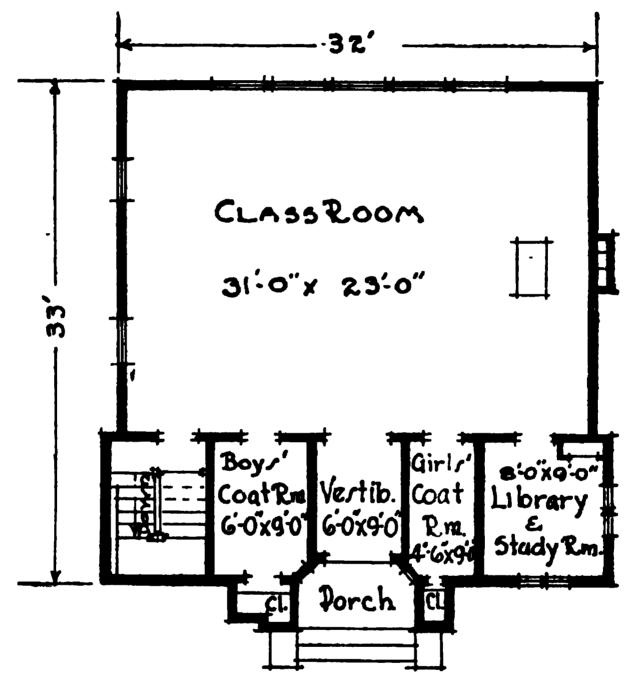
Floor plan, Crossroads School, Macon Co., Ill.
